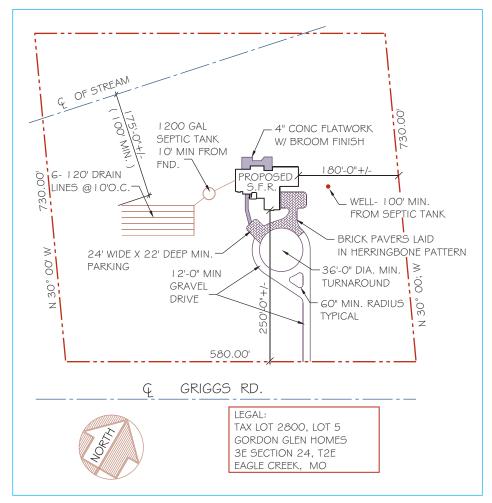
A site plan is used to show how the structure relates to the site. When the site is relatively flat, grading information is placed on this drawing.
